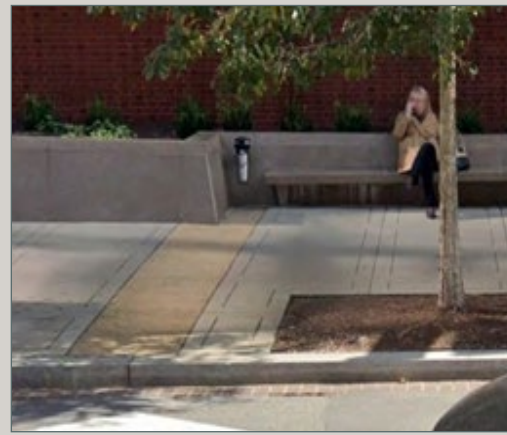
Exposed aggregate accent pavement outside the New Executive Office Building on 17th Street, NW.
